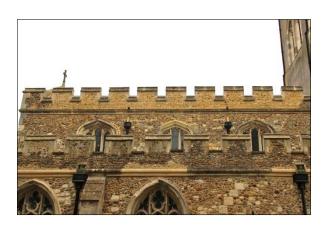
Finished works, north aisle string course and replaced north nave parapet (64)
